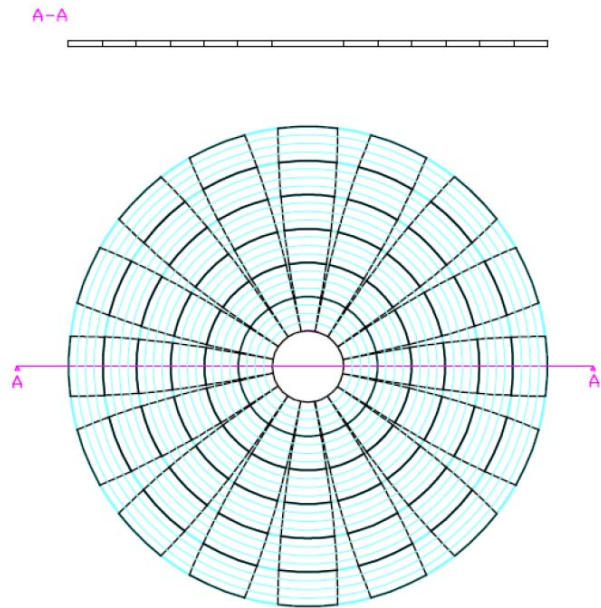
Floor plan and cross section of the flat structure. (Source: [22])
